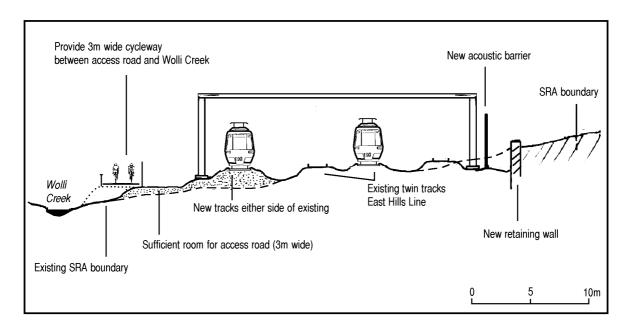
Section of rail corridor showing potential location of rails-with-trail* Source: adapted from State Rail Authority (1995b)
